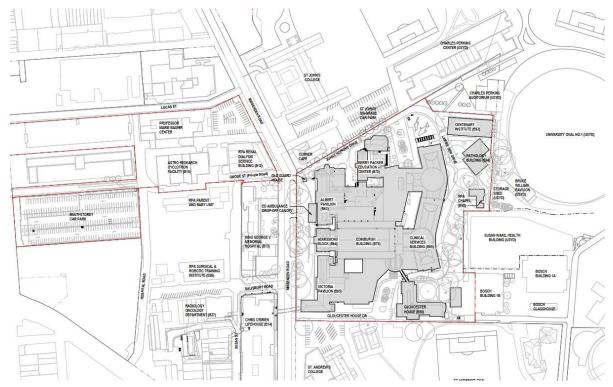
Existing Site Plan (Source: Bates Smart, Jacobs, and Neeson Murcutt + Neille)
